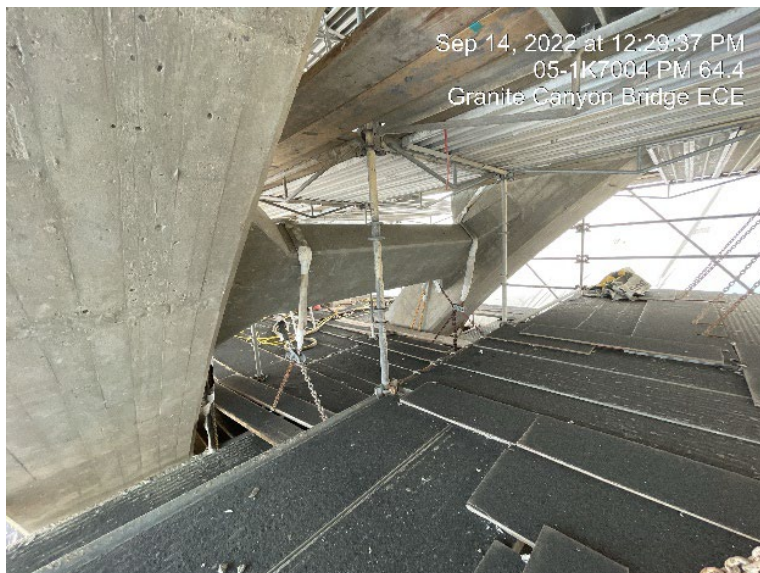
Concrete Surface Prepared for Application of Silane Waterproofing per SSPC-SP 13/NACE No. 6
